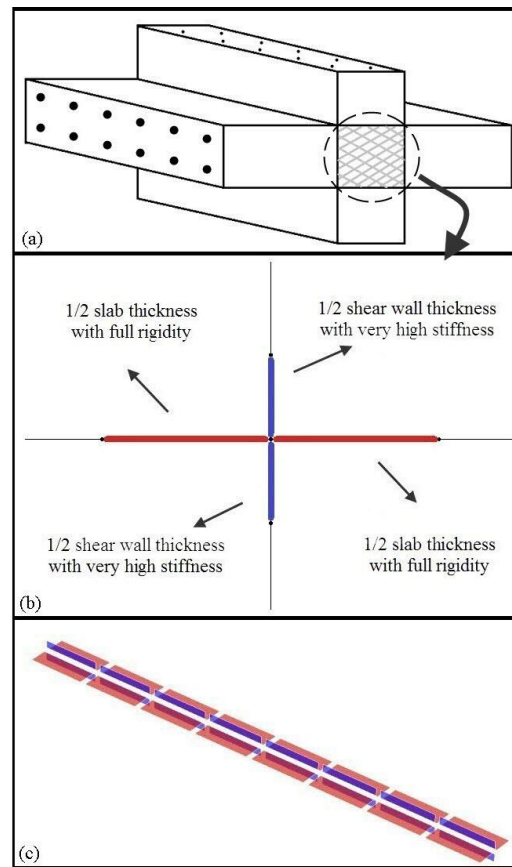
Proposed model for slab-wall connection, (a) Shear wall-slab intersection region (panel zone), (b) Proposed model for the panel zone, (c) Shear wall-slab connection in 3D (one span with eight equal segments)
